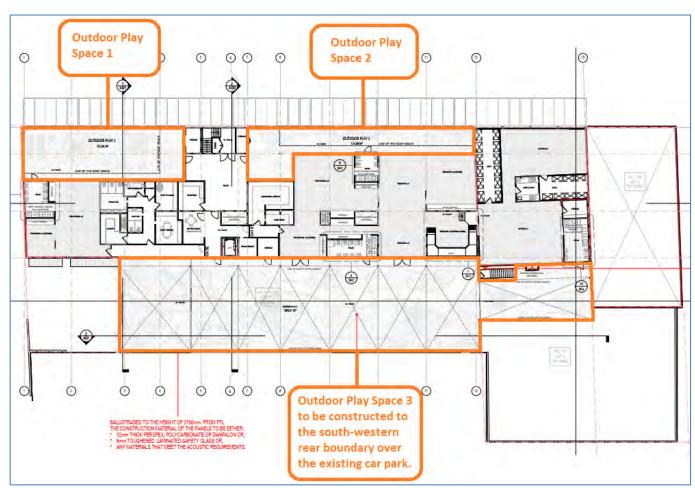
Proposed First Floor Plan indicating the location of the outdoor play spaces within the proposed childcare centre.
